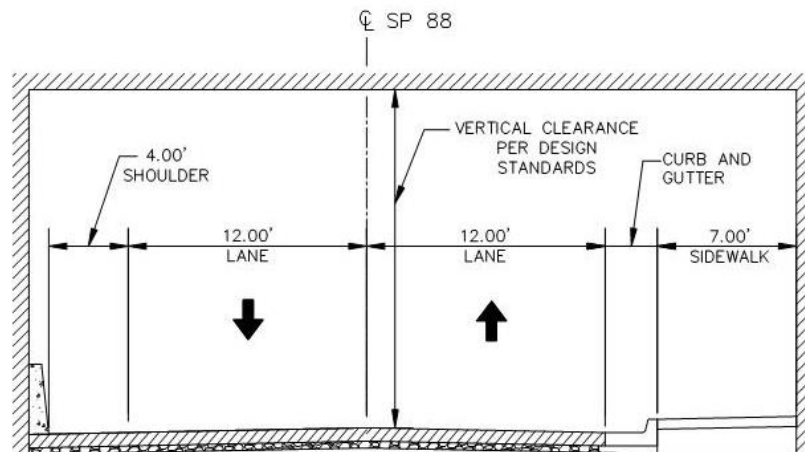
Proposed Cross Section of SP 88 Underpass Below NM 22, looking east
